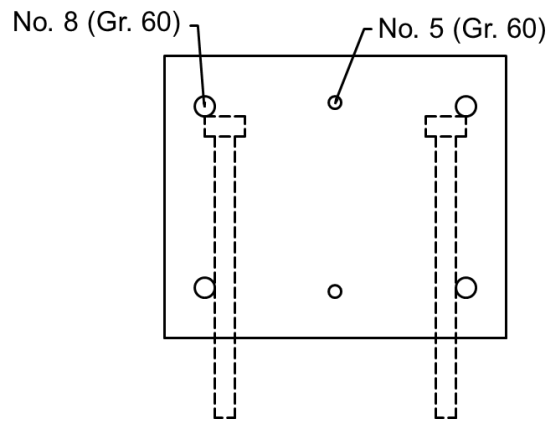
Layout B1: 4 No. 8 + 2 No. 5 (Gr. 60)
